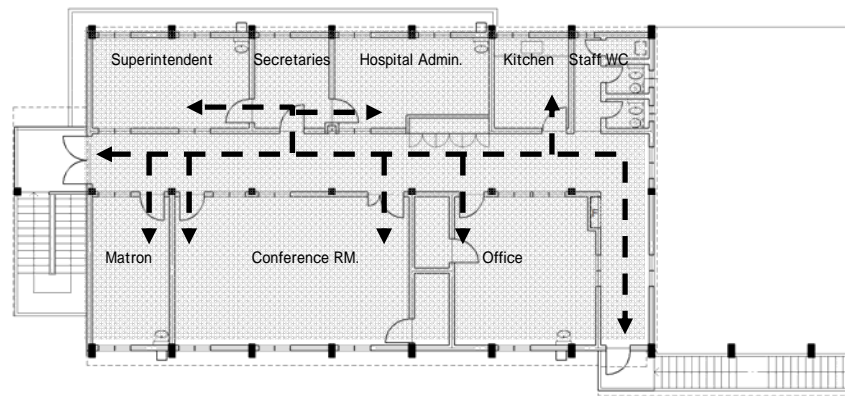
Chilenje UHC (1st Floor) Administration Department
